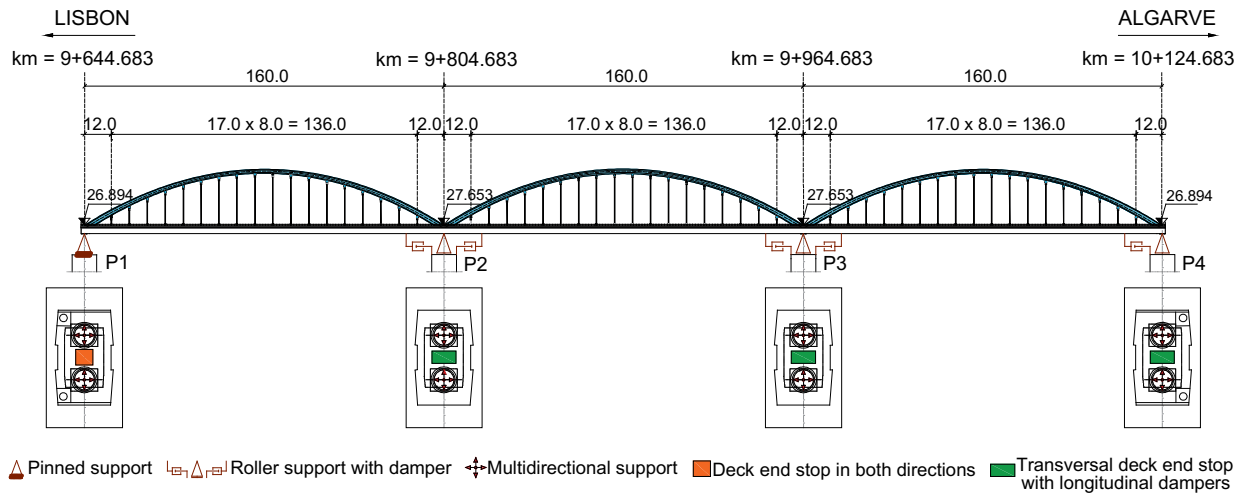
Lateral view of the bridge with a detail from the bearing devices (adapted from GRID et al. [44]).
